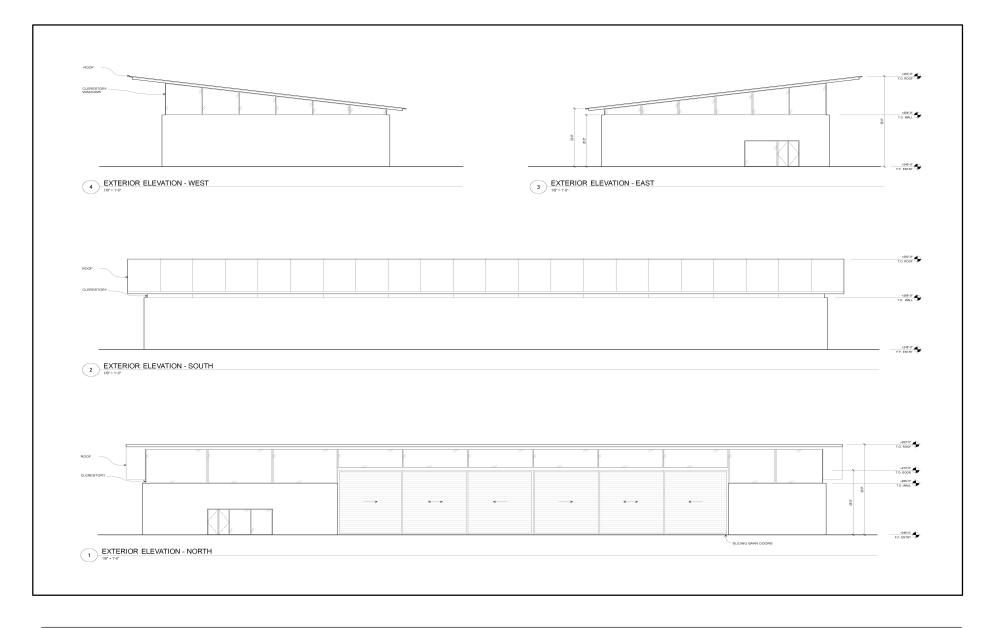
Elevation Views of Proposed Material Recovery Facility
